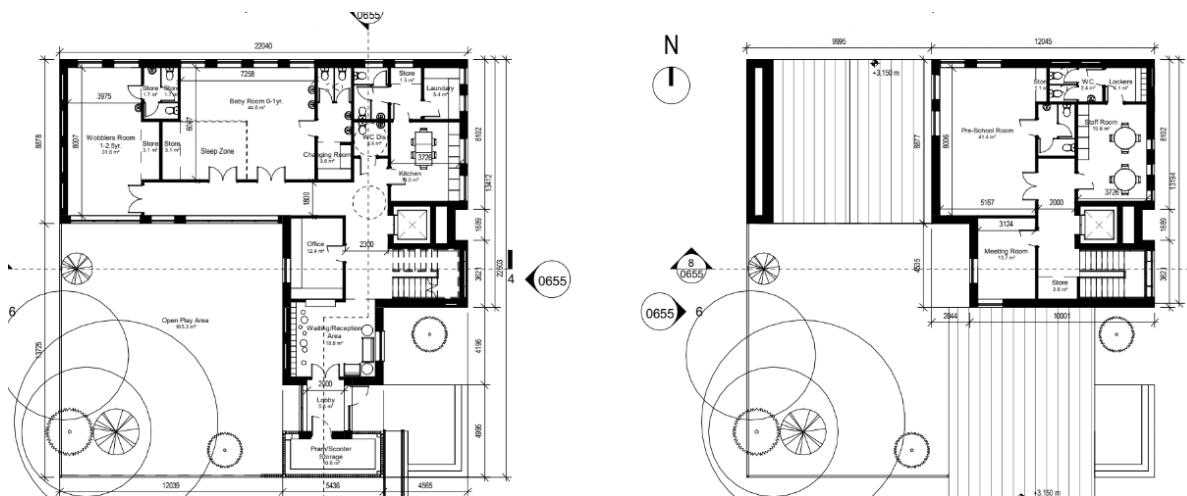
Ground (left) and first (right) floor plans of the proposed Hampton Central Creche unit.
